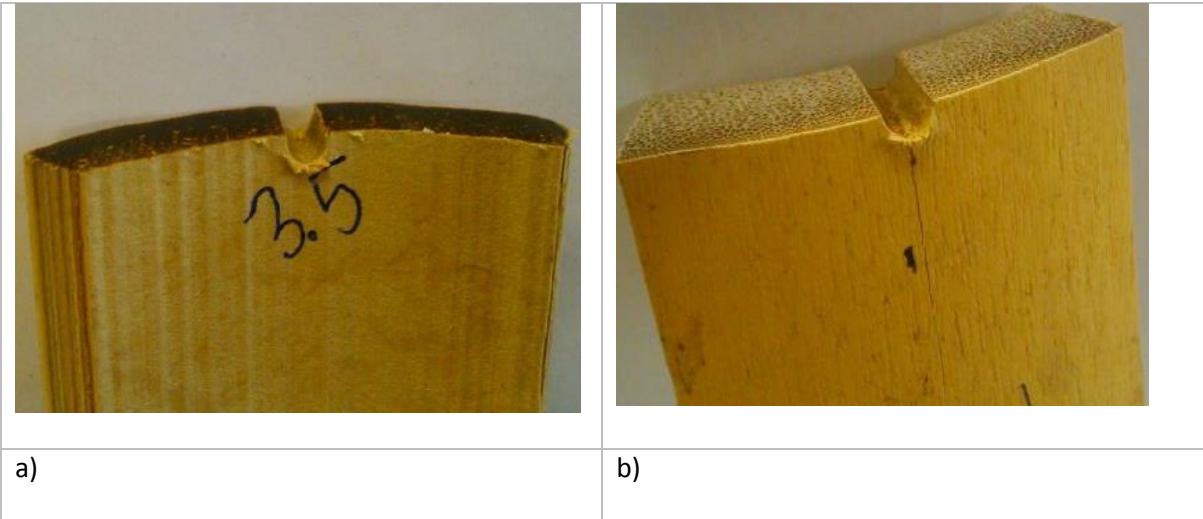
a) Typical bearing failure, b) bearing failure with evidence of cracking.
